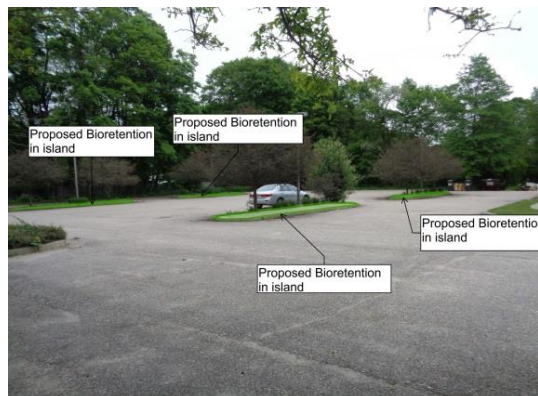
View of proposed bioretention areas located within parking lot islands at the Courthouse Center for the Arts.
